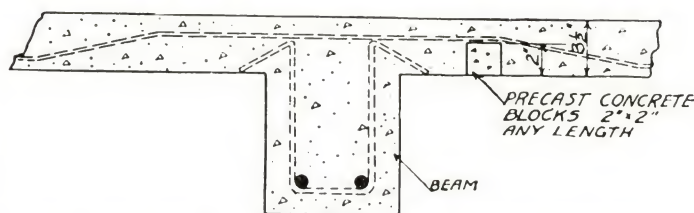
, Showing Inexpensive Method of Supporting Wire Fabric Reinforcement Over Concrete Beams
